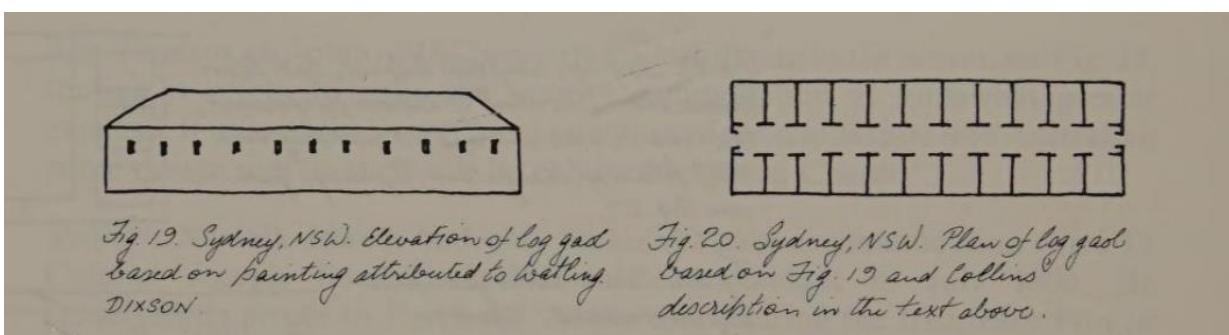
Conjectural reconstruction of elevation and plan of Sydney gaol by Kerr (Design for Convicts, p19).
